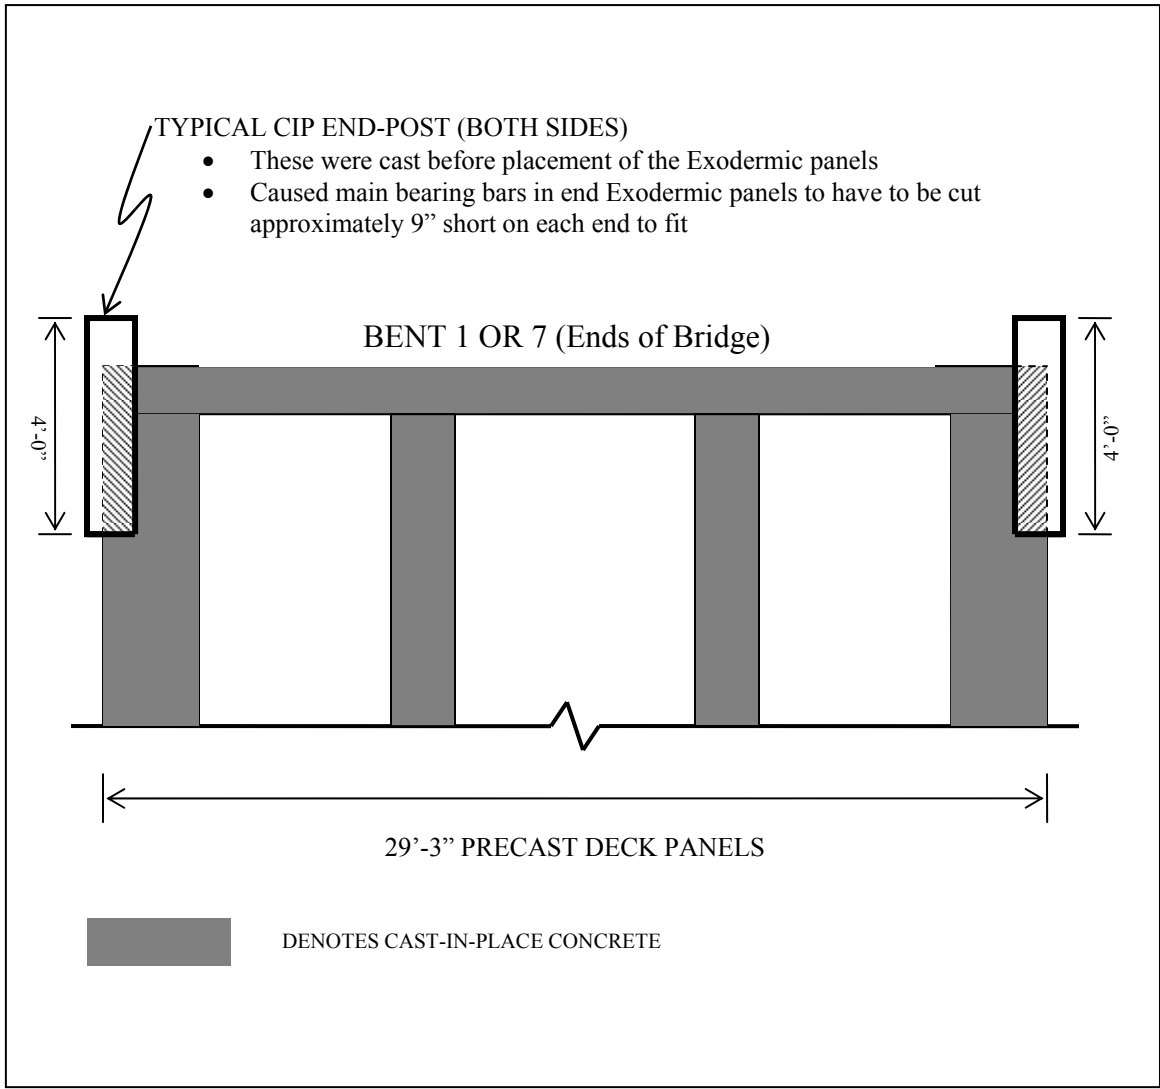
Plan View of Endposts and Modified Precast Deck Panels At One End of Bells Mill Bridge
